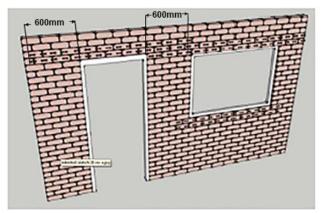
Example of bed joint reinforcement (courtesy of Edenhall)
